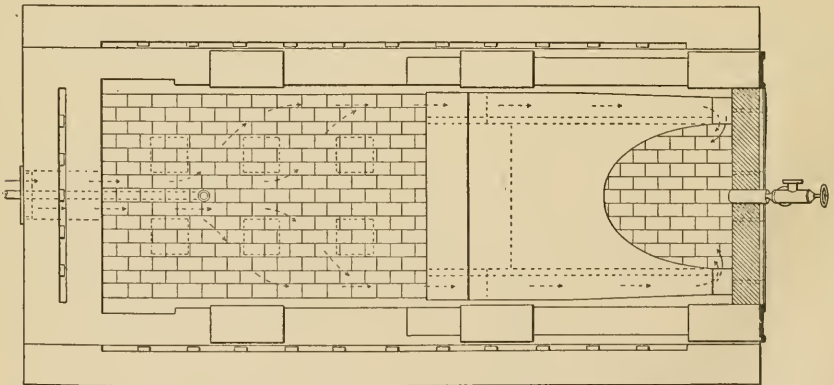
PLAN VIEW OF FURNACE, WITH BOILER REMOVED.
